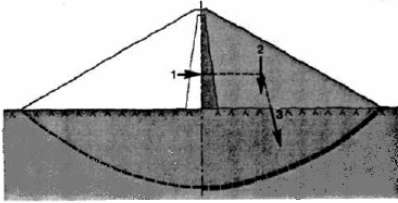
Embankment dam with central core. Stresses redistribution in foundation rock after construction of embankment dam. [Reinius, 1988]
